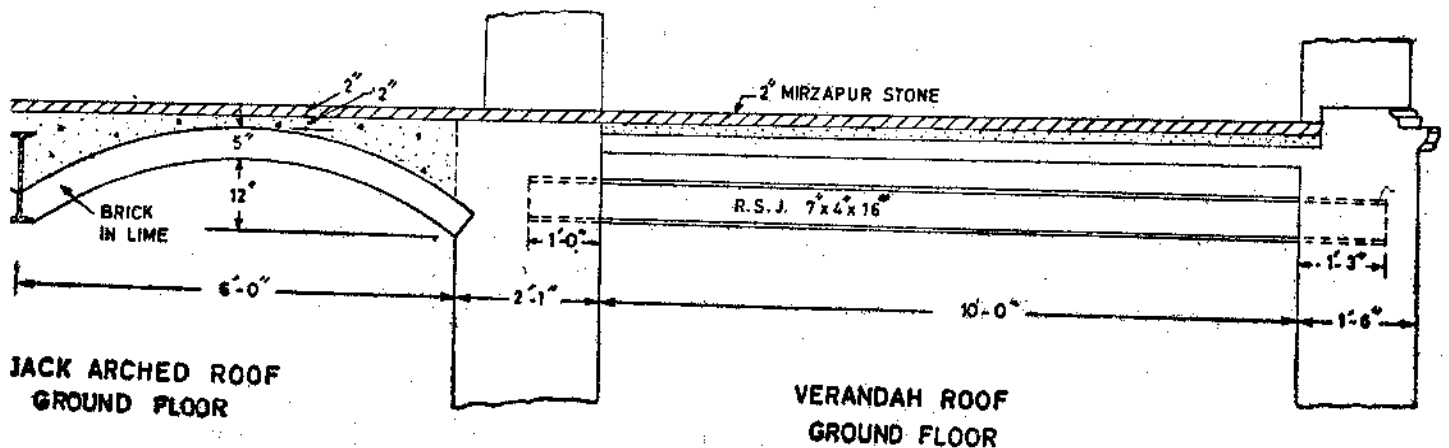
B. Ground Floor Roof, Civil Court, Laheria Serai.
